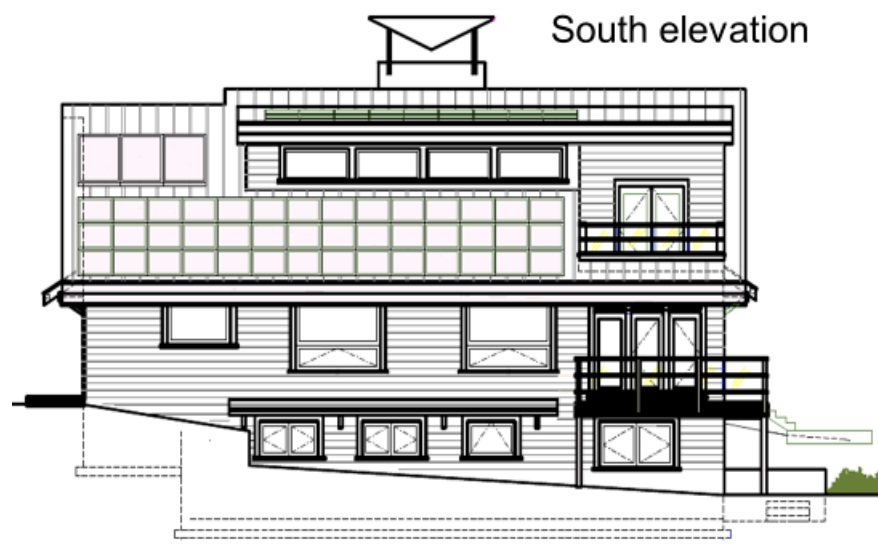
South elevation shows plenty of windows and two levels of solar panels placed on two roofs with different slopes (see later text) and two levels of slab on the ground, because of the sloped terrain on which the house is located. Courtesy of Chris Mattock.
